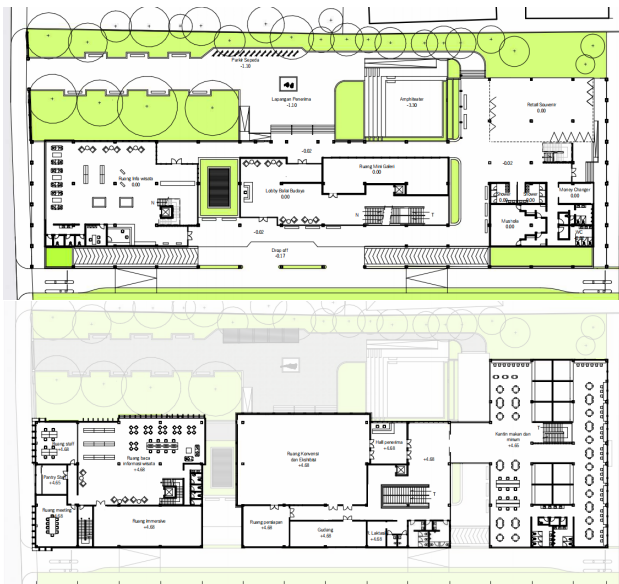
First and second floor plan of Tourist Information and Cultural center
